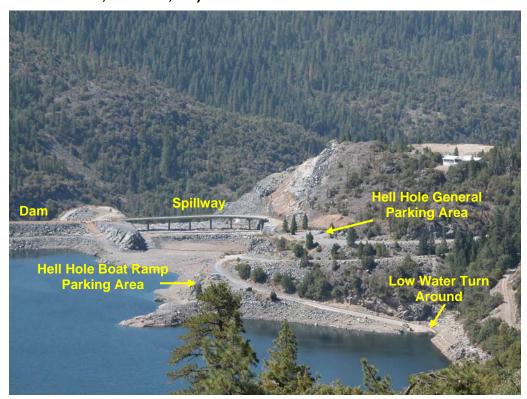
Hell Hole Boat Ramp with dam and spillway in background. (July 20, 2004, WSE = 4,596).
